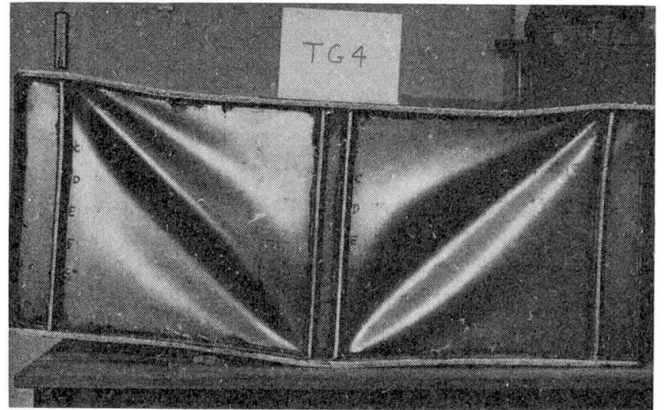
Girder TG4 after test to failure. Note well developed hinges.
